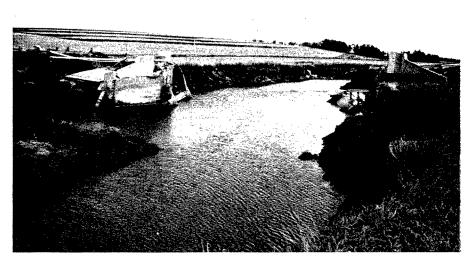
View, looking southeast (downstream), of Iowa Highway 71 bridge failure at Brushy Creek, approximately 13 km south of Carroll, Iowa.
